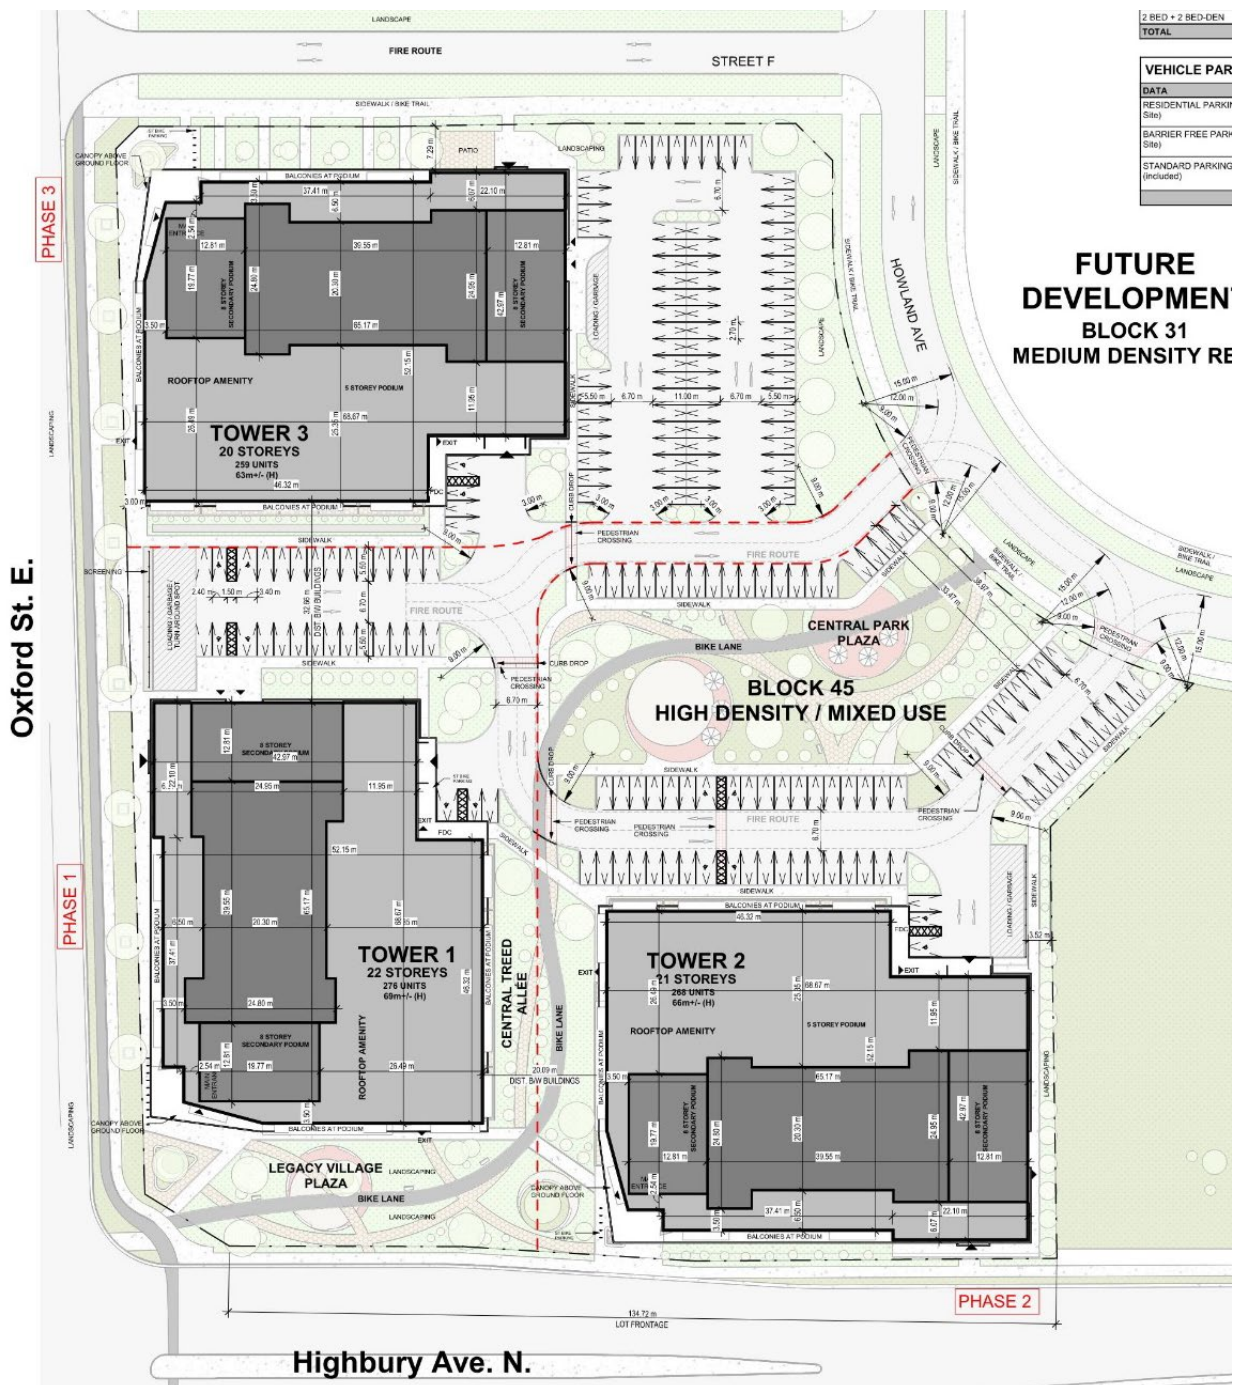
Previous Conceptual Plan of 20-22 Storey Towers on Block 16 at the Southeast Corner of Highbury Avenue North and Oxford Street East
